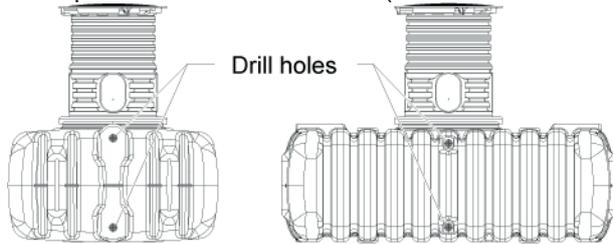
The openings for these connections must be made with a core drill 58 mm in diameter. The openings take the DN 50 special seals. Lubricant should be applied to the seal and the end of the pipes: they can then slide more easily over each other.
